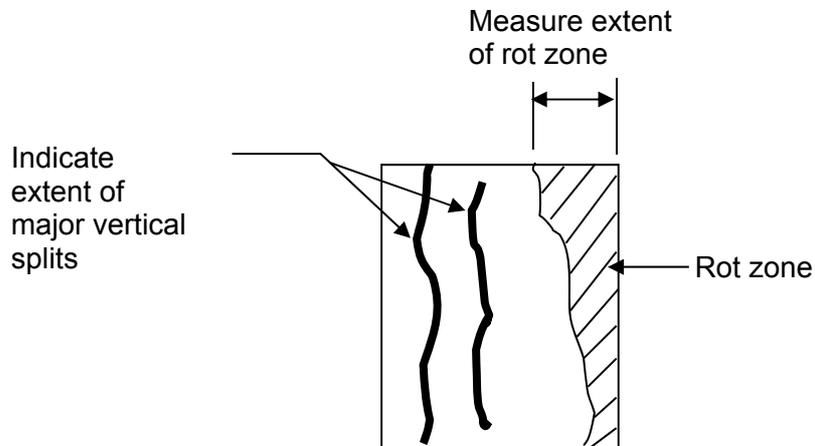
HALFCAP SKETCH EXAMPLE - END VIEW
